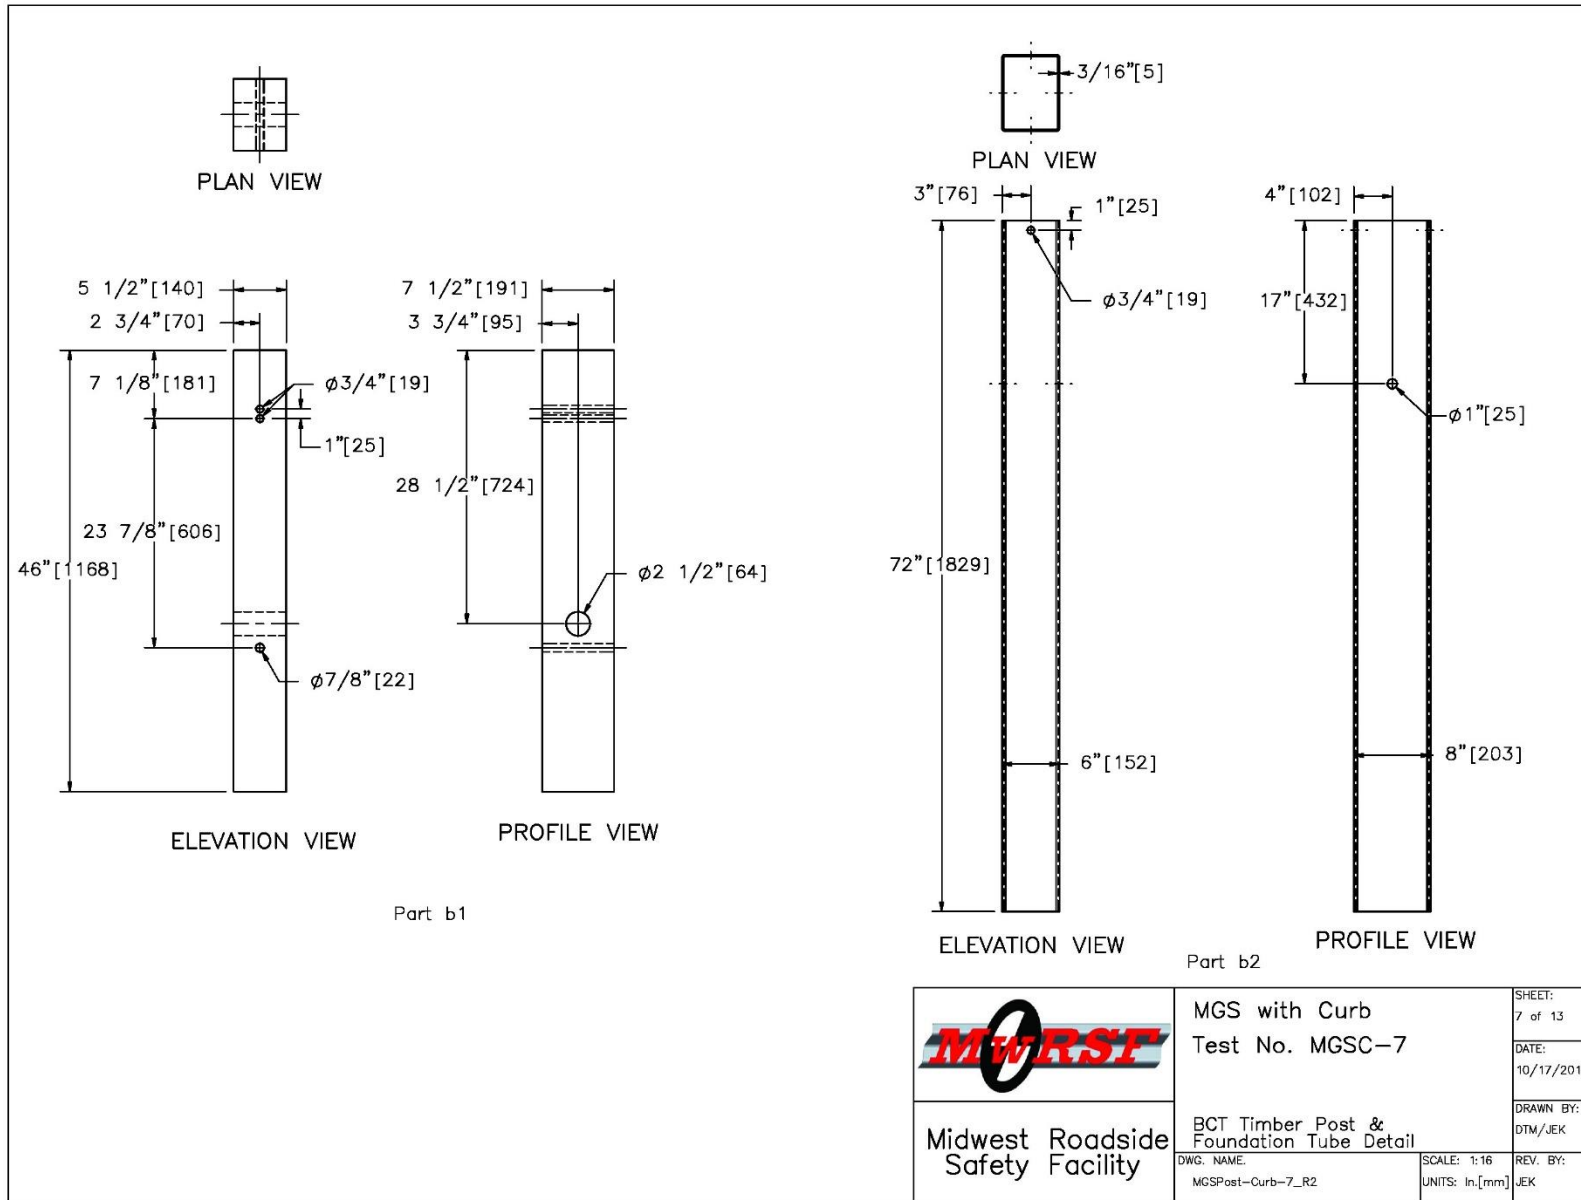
BCT Timber Post and Foundation Tube Detail, Test No. MGSC-7
